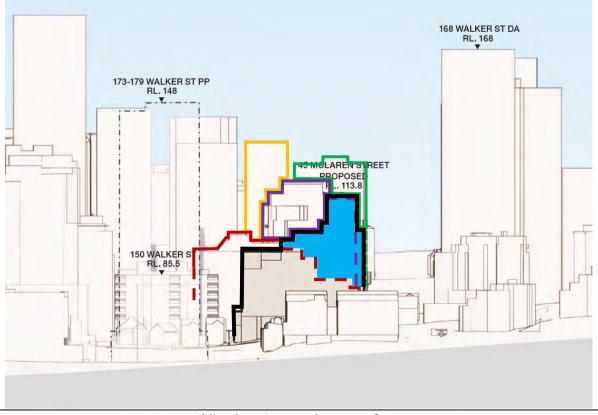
Building locations to the west of 45 McLaren Street (Base image source: Urban Design Report – BatesSmart)
